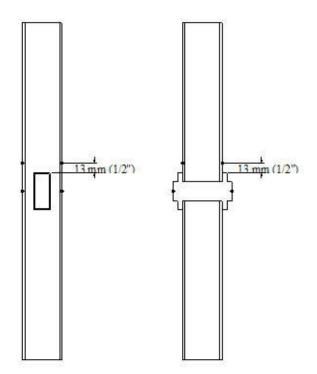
Glazed Wall and Sloped Glazing Thermocouple Placement
